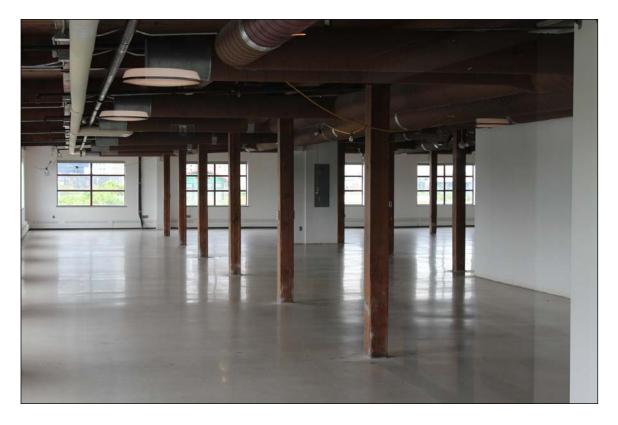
Johnston Terminal Building, 25 Forks Market Road, vacant fourth floor office space, 2019. (M. Peterson, 2019.)
